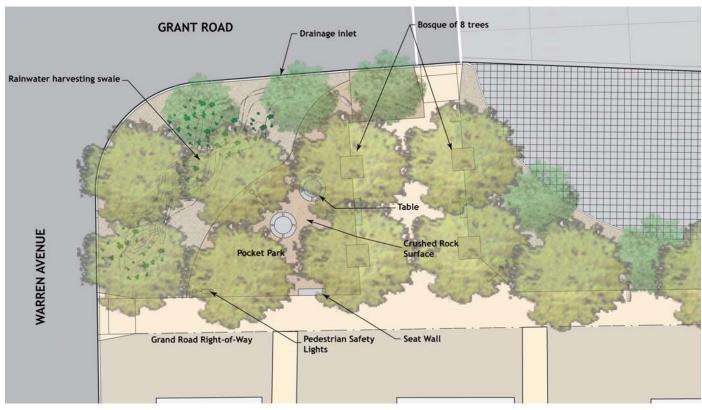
Plan of Pocket Park at Warren Avenue Intersection
